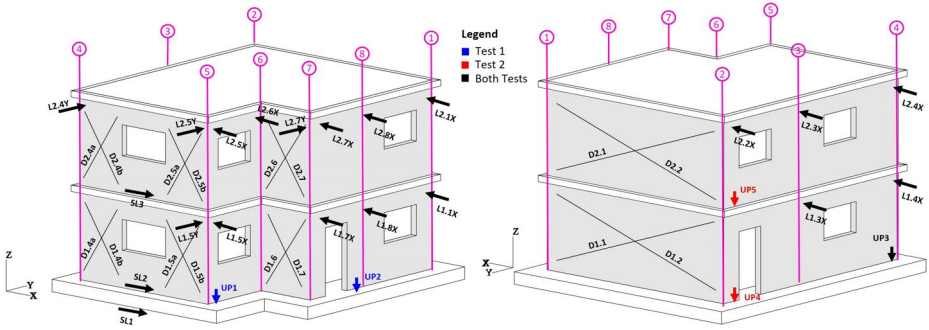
LVDT configuration: (a) North-West façade, (b) South-East façade
